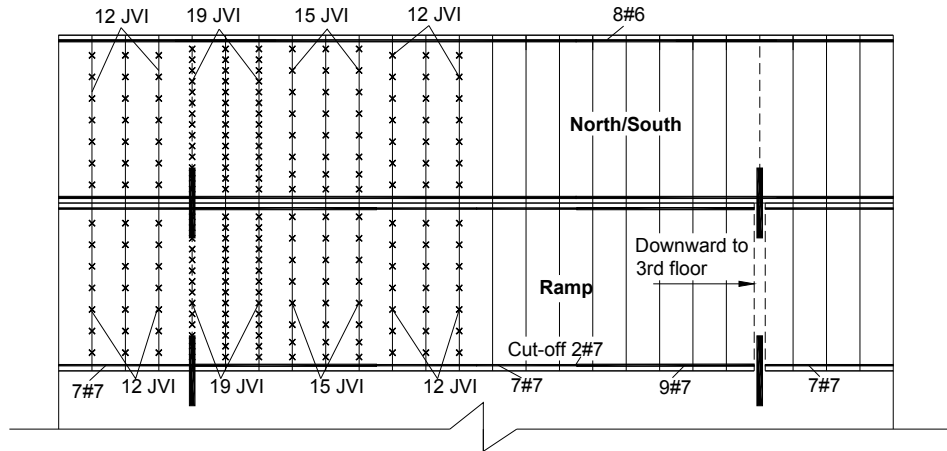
Diaphragm reinforcement at top floor for example 2B.
